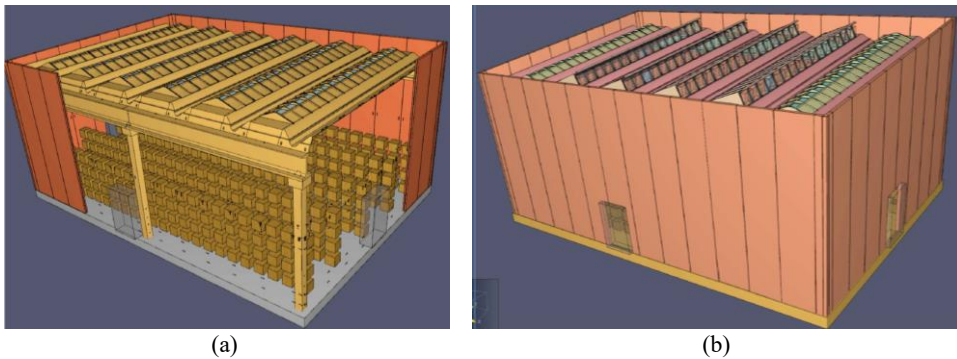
Case study archetypal precast industrial structures with: (a) vaulted roof; (b) shed roof.
